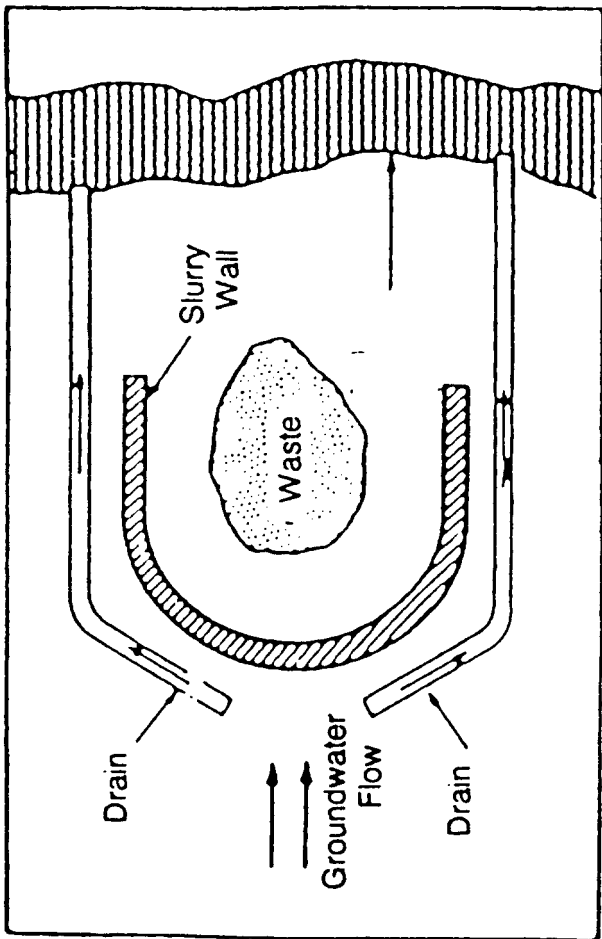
Plan of circumferential wall placement (Spooner et al., 1984).
